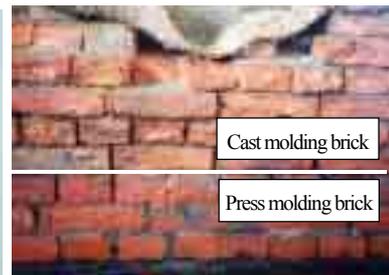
East side of Kiln 5 (A part of foundation made by press molding brick)
